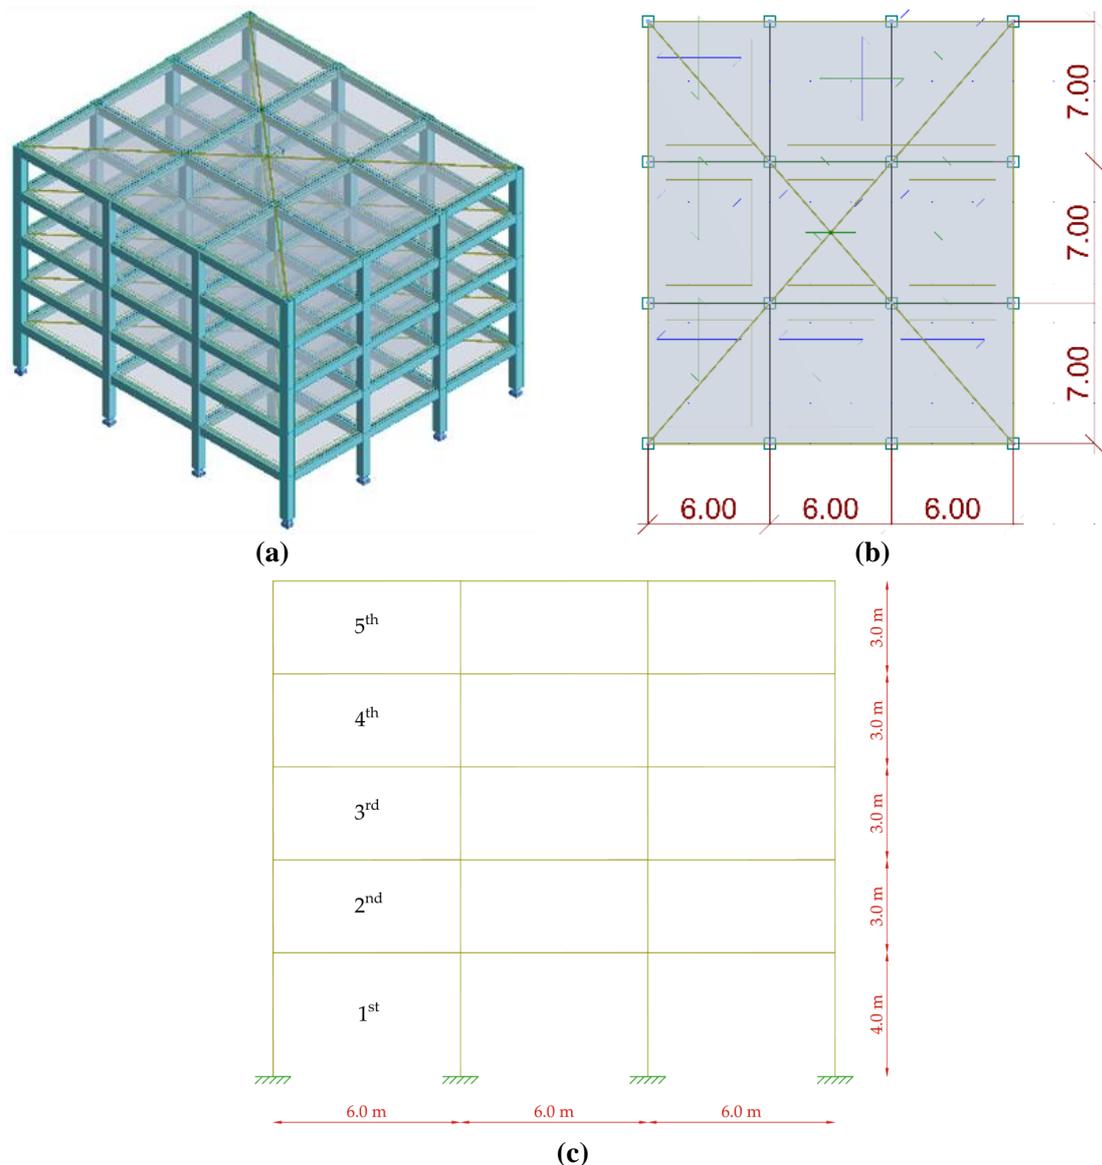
Frame building system configuration: (a) 3D Model. (b) Planview. (c) Cutaway.
